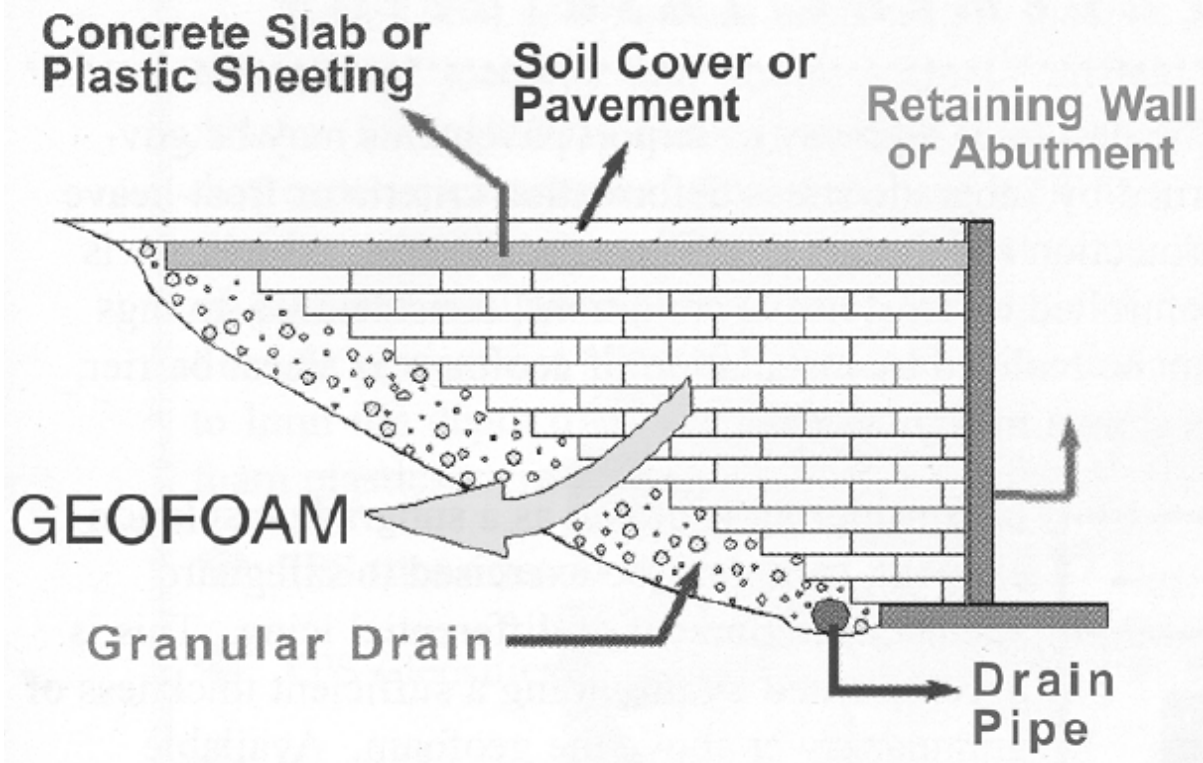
Typical Construction Detail for EPS GeoFoam Backfilled Earth Retention Structure (from Negussey 1997)
